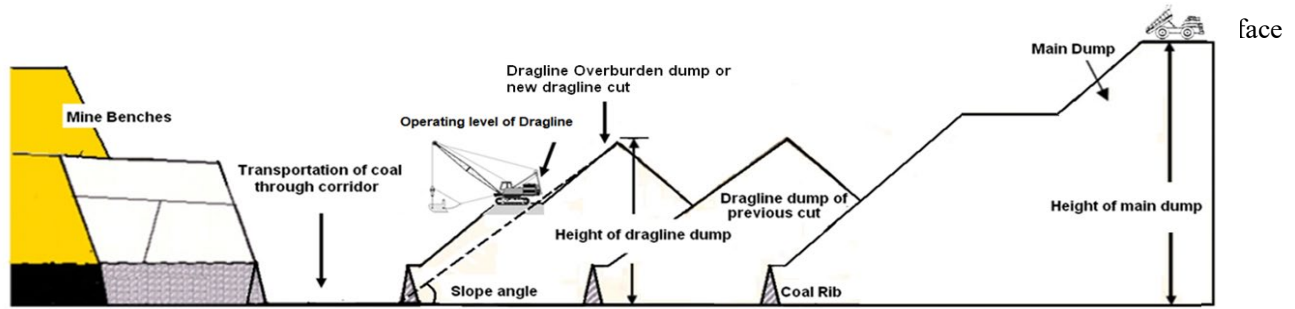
Typical layout of internal dragline dump with mine benches (Gupta, et.at 2014)
